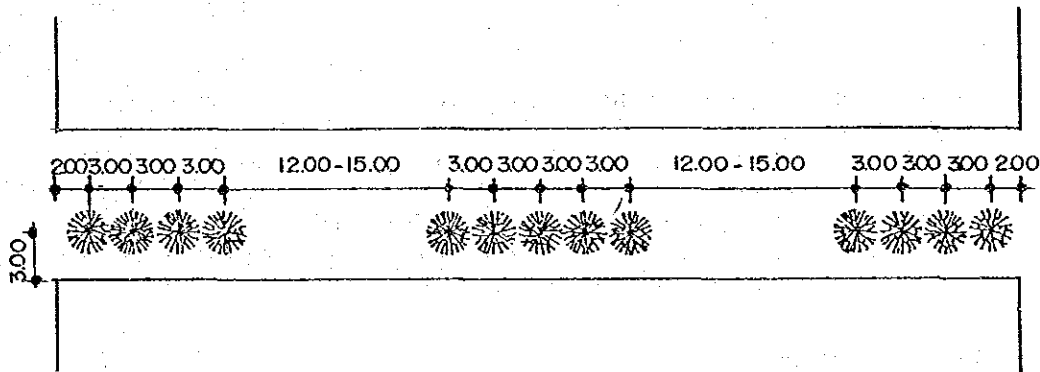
STREET VEGETATION LAYOUT PLAN
